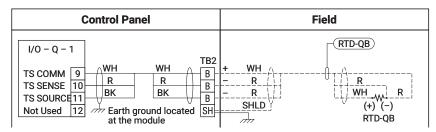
Typical RTD installation from the NGC-40-IO module in a North American style panel
